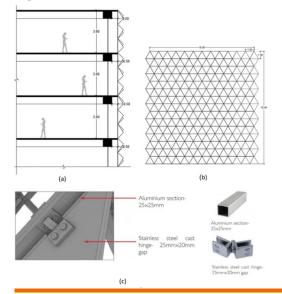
(a) Sectional Detail Showing the Fixing Position of the Kinetic Façade; (B) Grid Framework for Placing Kinetic Façade Modules; (C) Panel to Frame Hinge Joinery Details.
